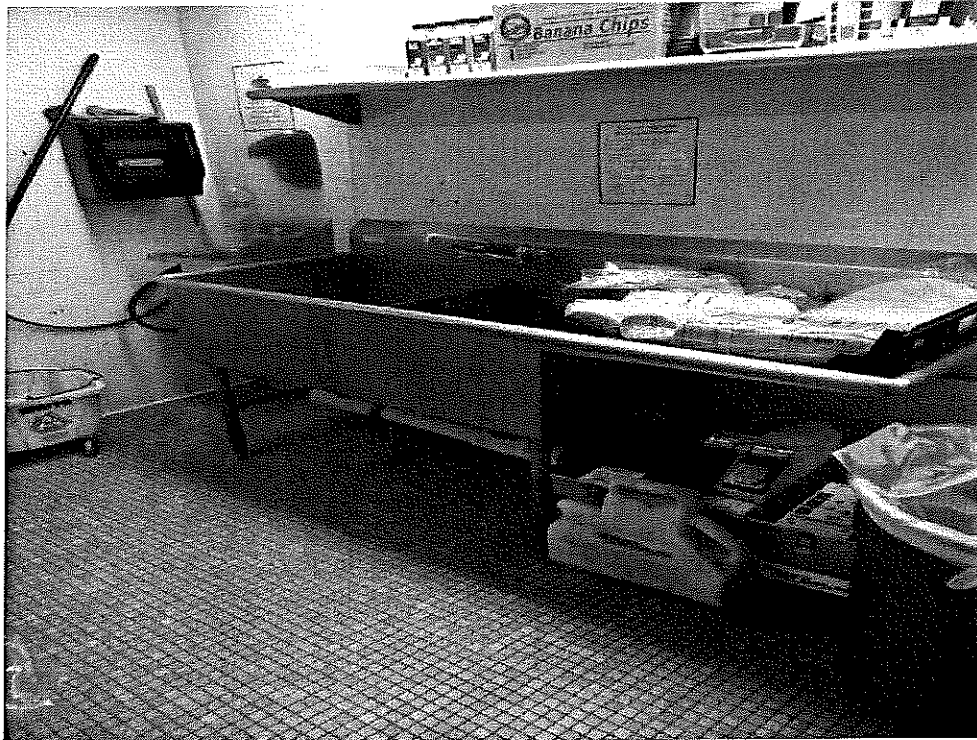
Kitchen Sinks with Grease Trap (Typical)
